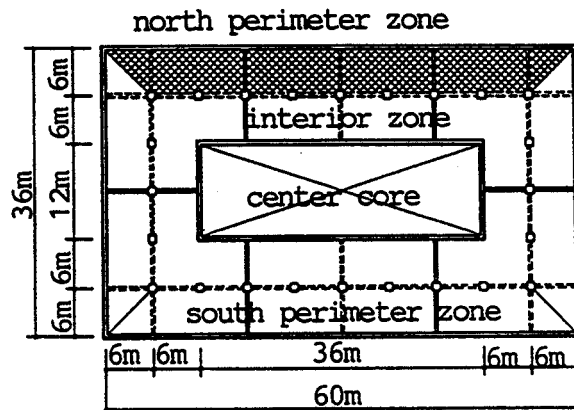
Sample Plan for Air-Conditioning Load Calculation
